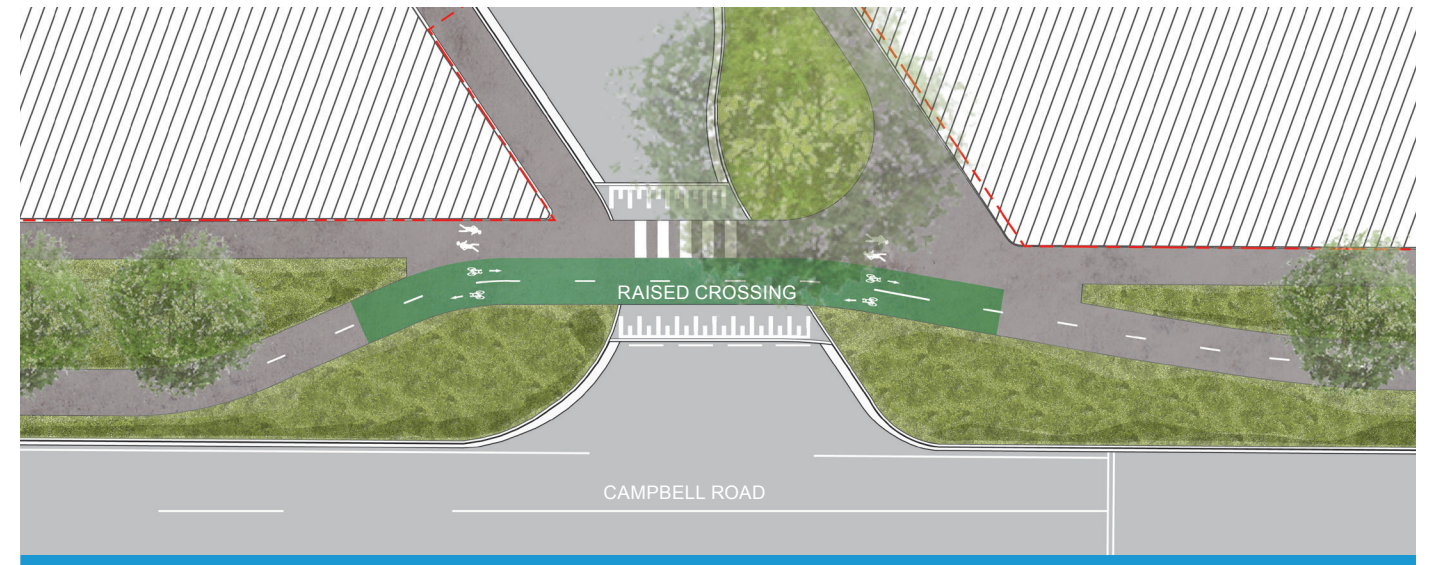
Campbell Street Green Link - Typical Raised Crossing (Barwon Park Road example)
